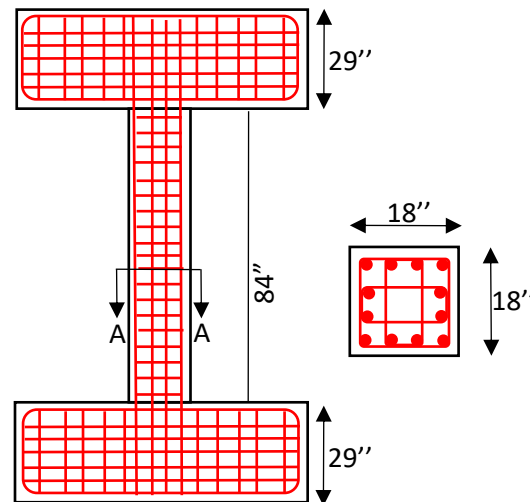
Vertical Section of Column Specimens. (Modified from Sokoli and Ghannoum 2016)
